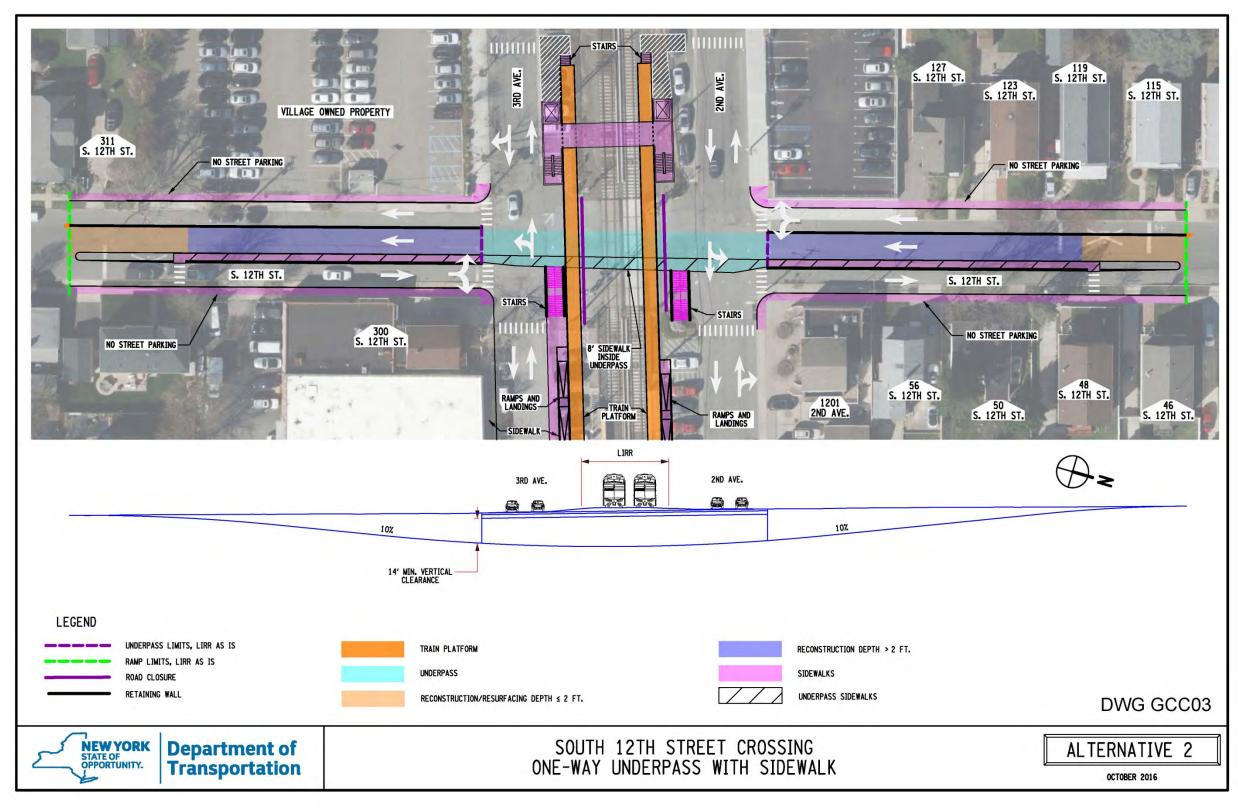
South 12th Street Crossing (Alternative 2: One-Way Underpass with Sidewalk)
